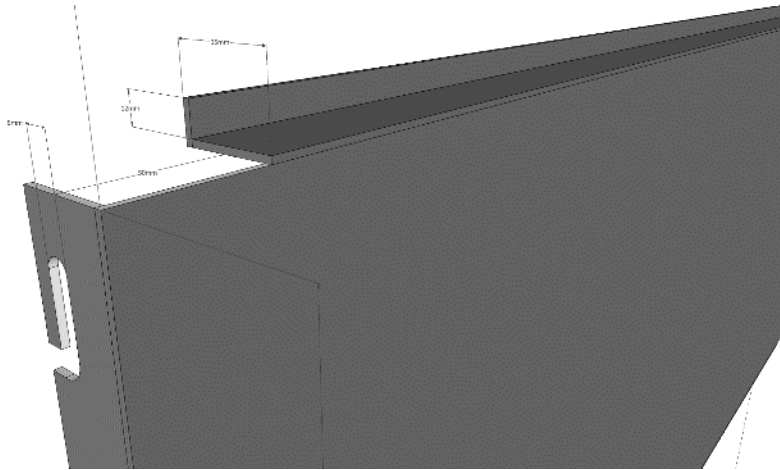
Detail drawing, showing the façade panel hang in system for easy installation
